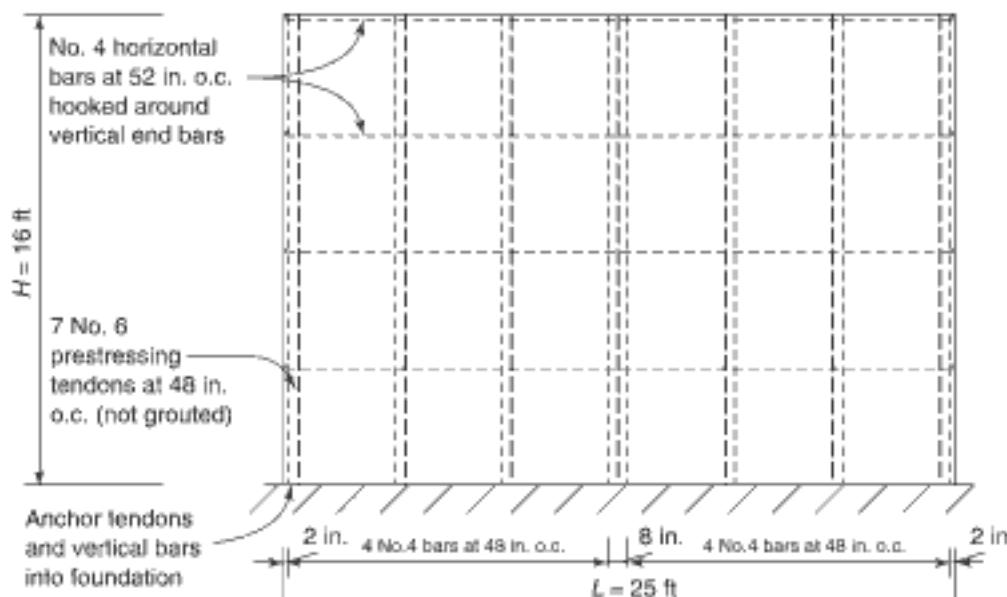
Masonry Shear Wall Reinforcement Details in Example 17.16.
